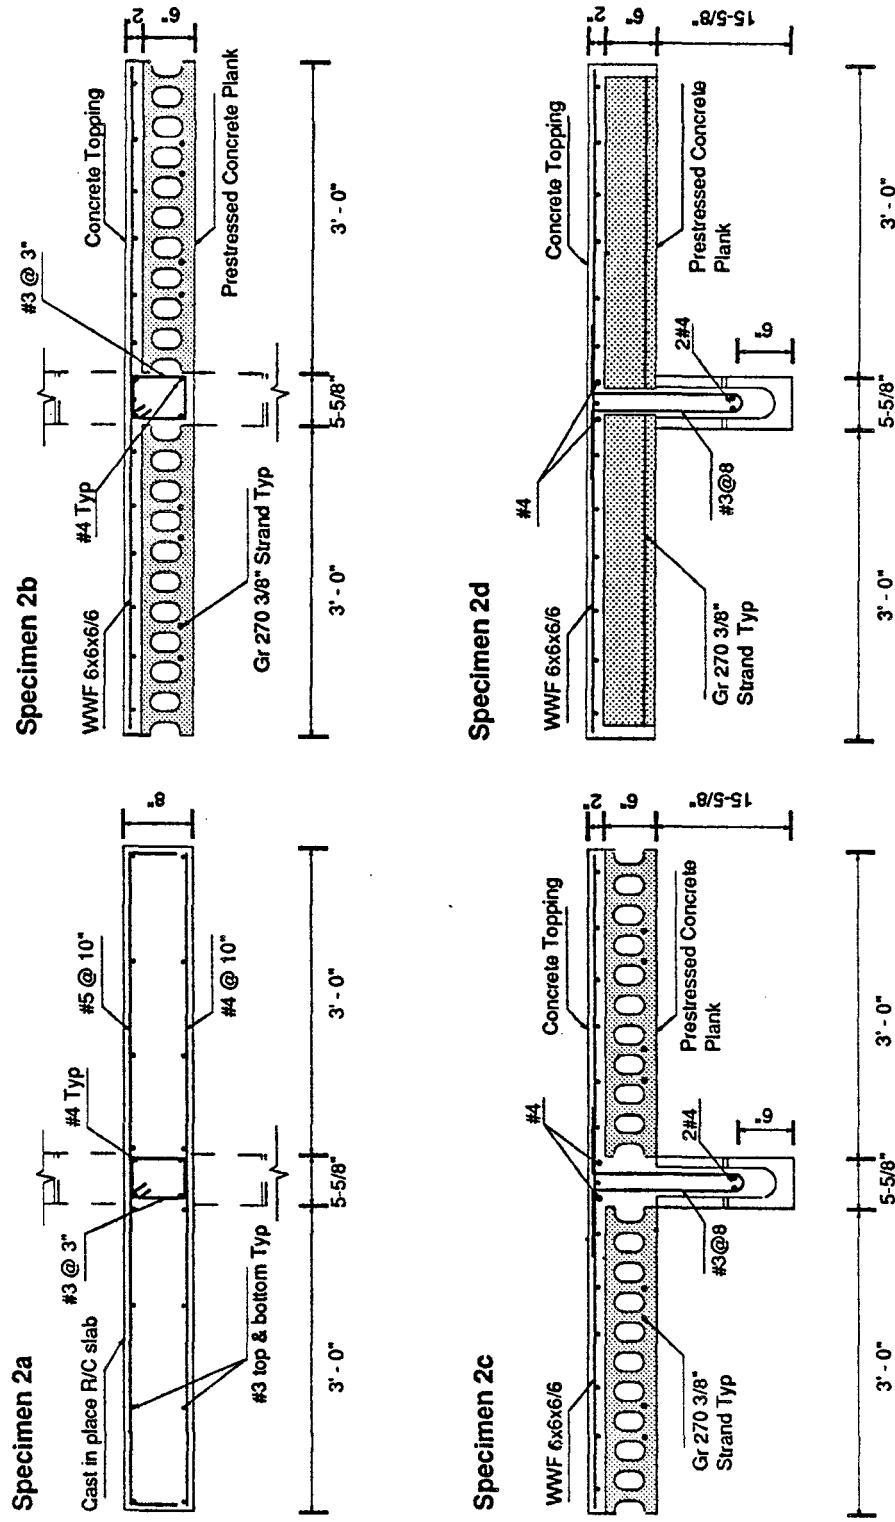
Type 2 Specimens, floor slab reinforcement detail.
